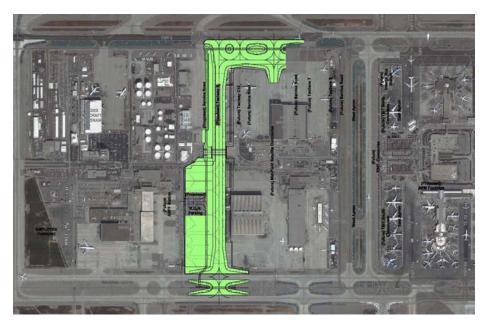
Crossfield Taxiway Project Location at LAX
